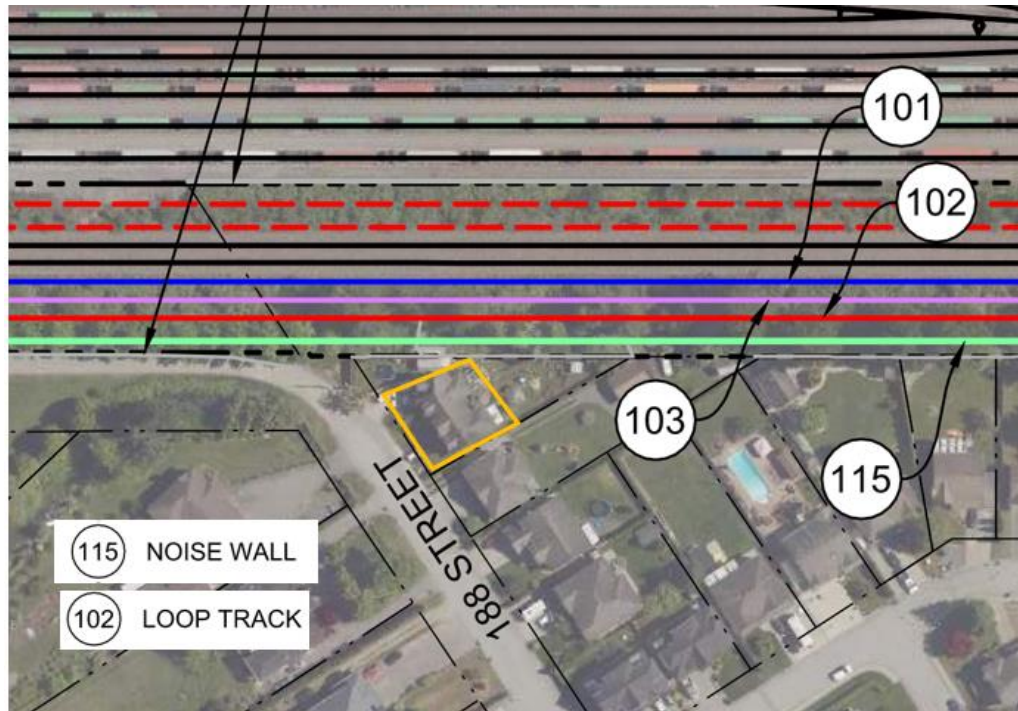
Excerpt from Facility General Arrangement Plan (dated 11/04/2021)
